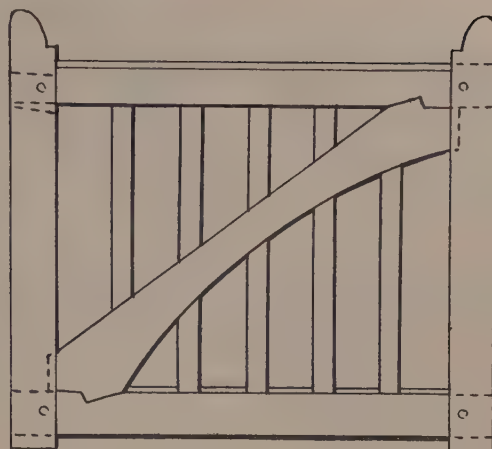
SUGGESTED TYPE OF GATE. SIZE, 3 FT. 9 IN. WIDE, OR AS REQUIRED.
